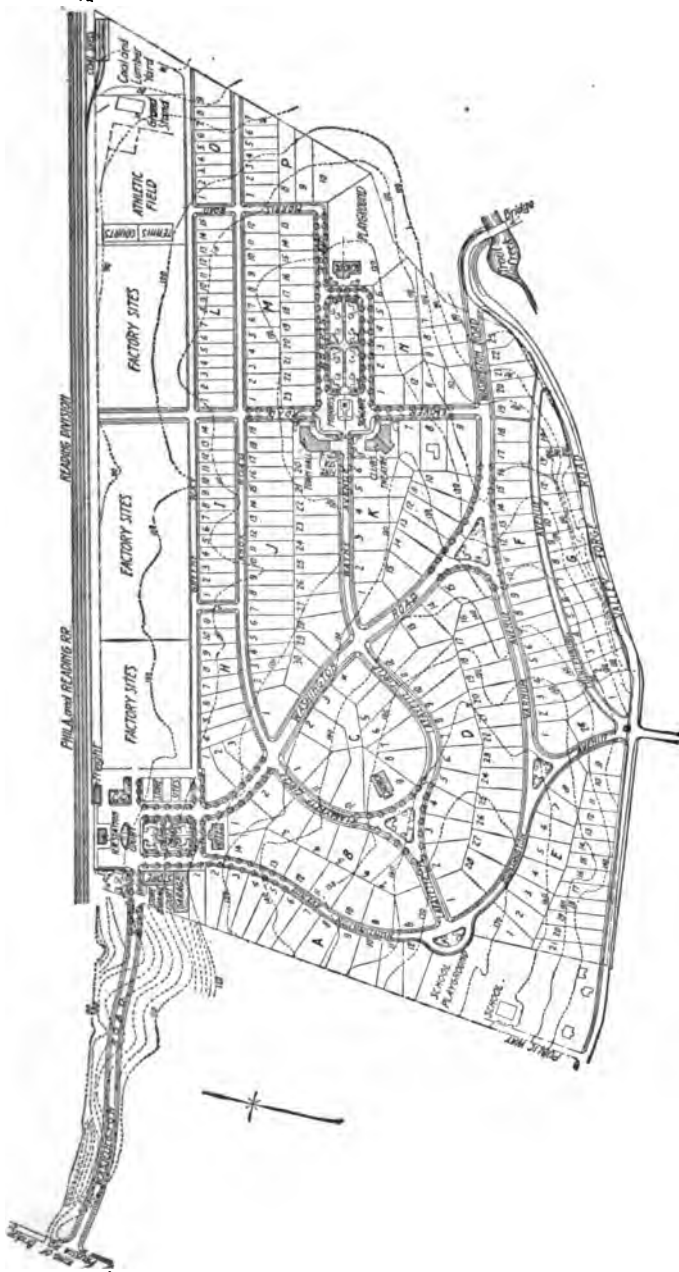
Town plan and block subdivision of the new town of East Valley Forge, Pa. A comprehensive plan for a small industrial village, making provision for various grades of dwellings, small commercial and civic centers, and for factory sites.
